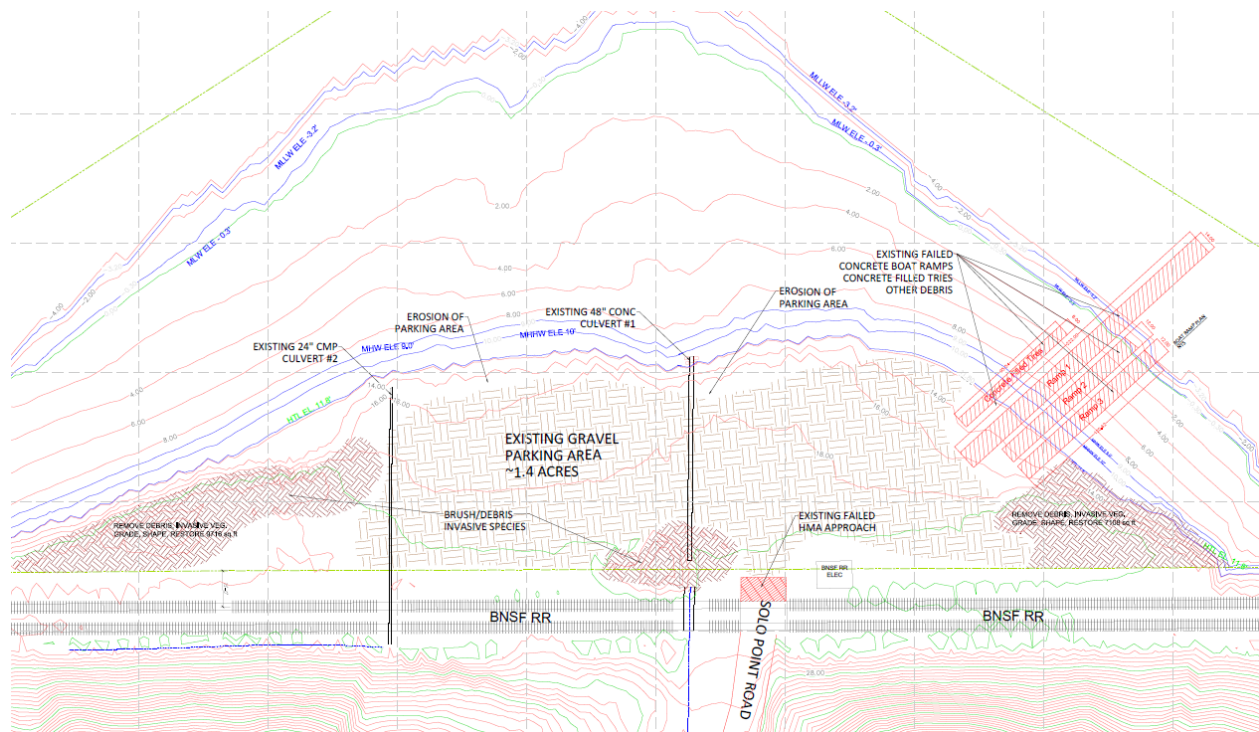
Existing site plan showing three extant ramps, tire debris, existing gravel parking area, the Burlington Northern Santa Fe (BNSF) Railway and culverts (one non-functional and other draining a perennial stream)
